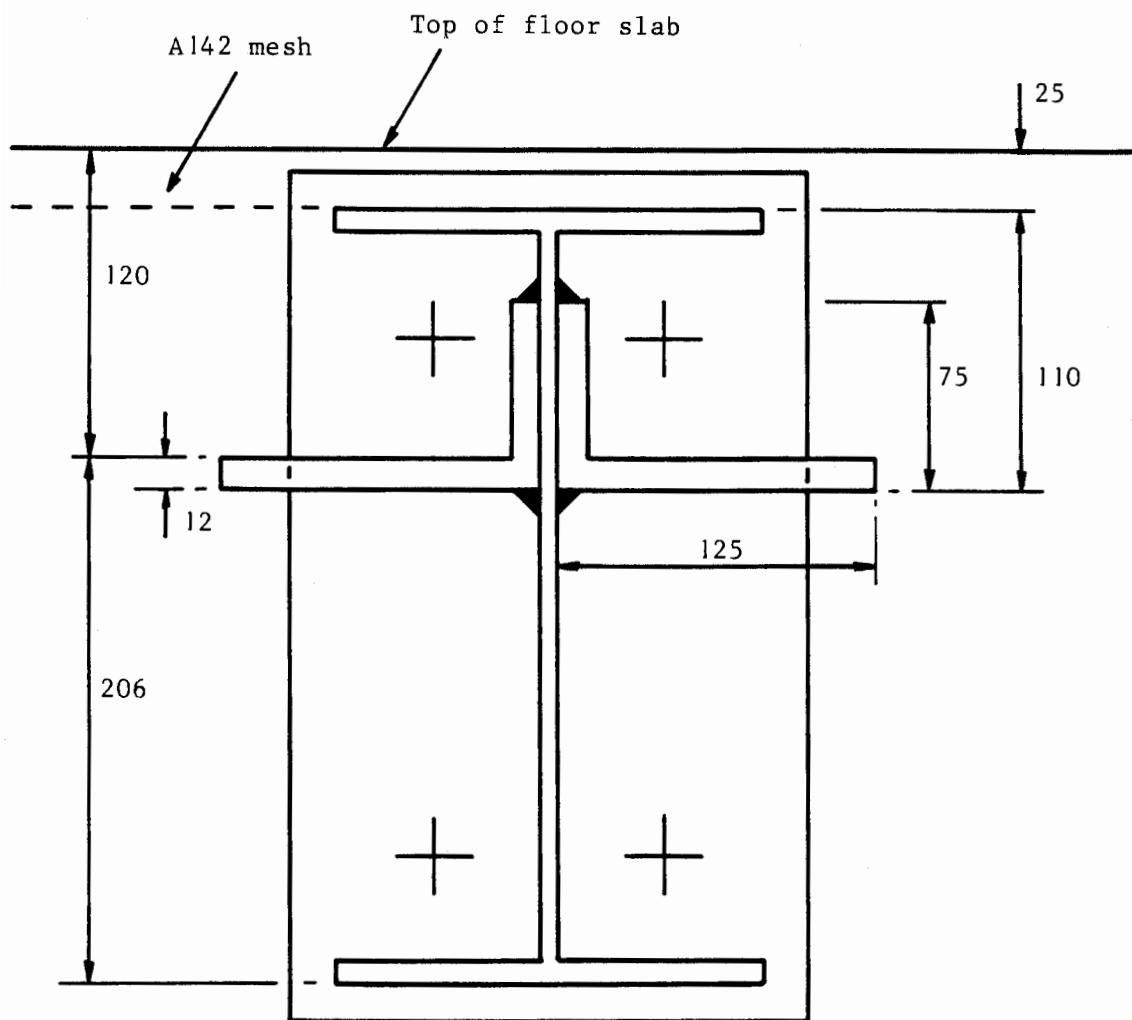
CONSTRUCTION DETAILS FOR ASSEMBLY NO. 6 (R4/3655)
